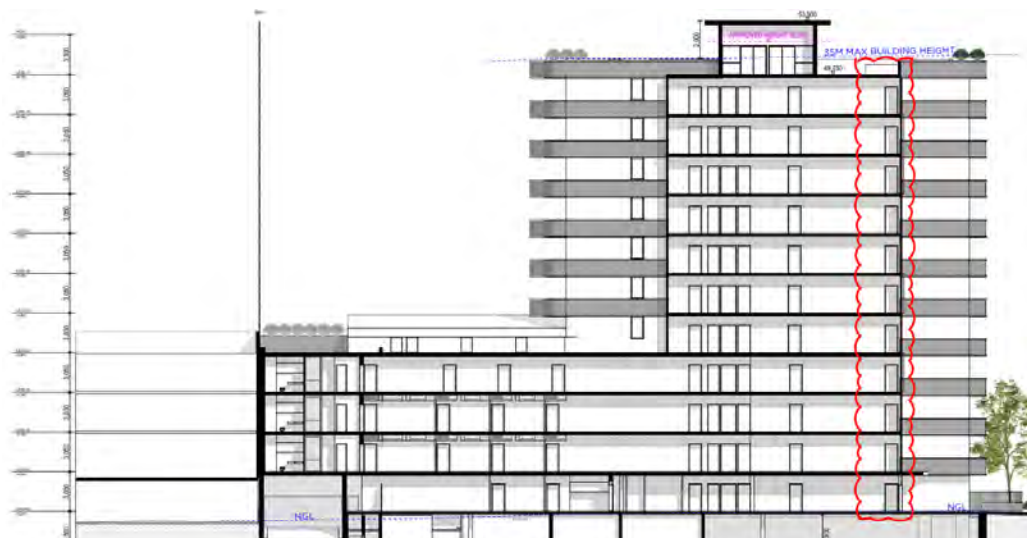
Approved DA2016/170/2 section plan showing 3.05m floor to floor height
